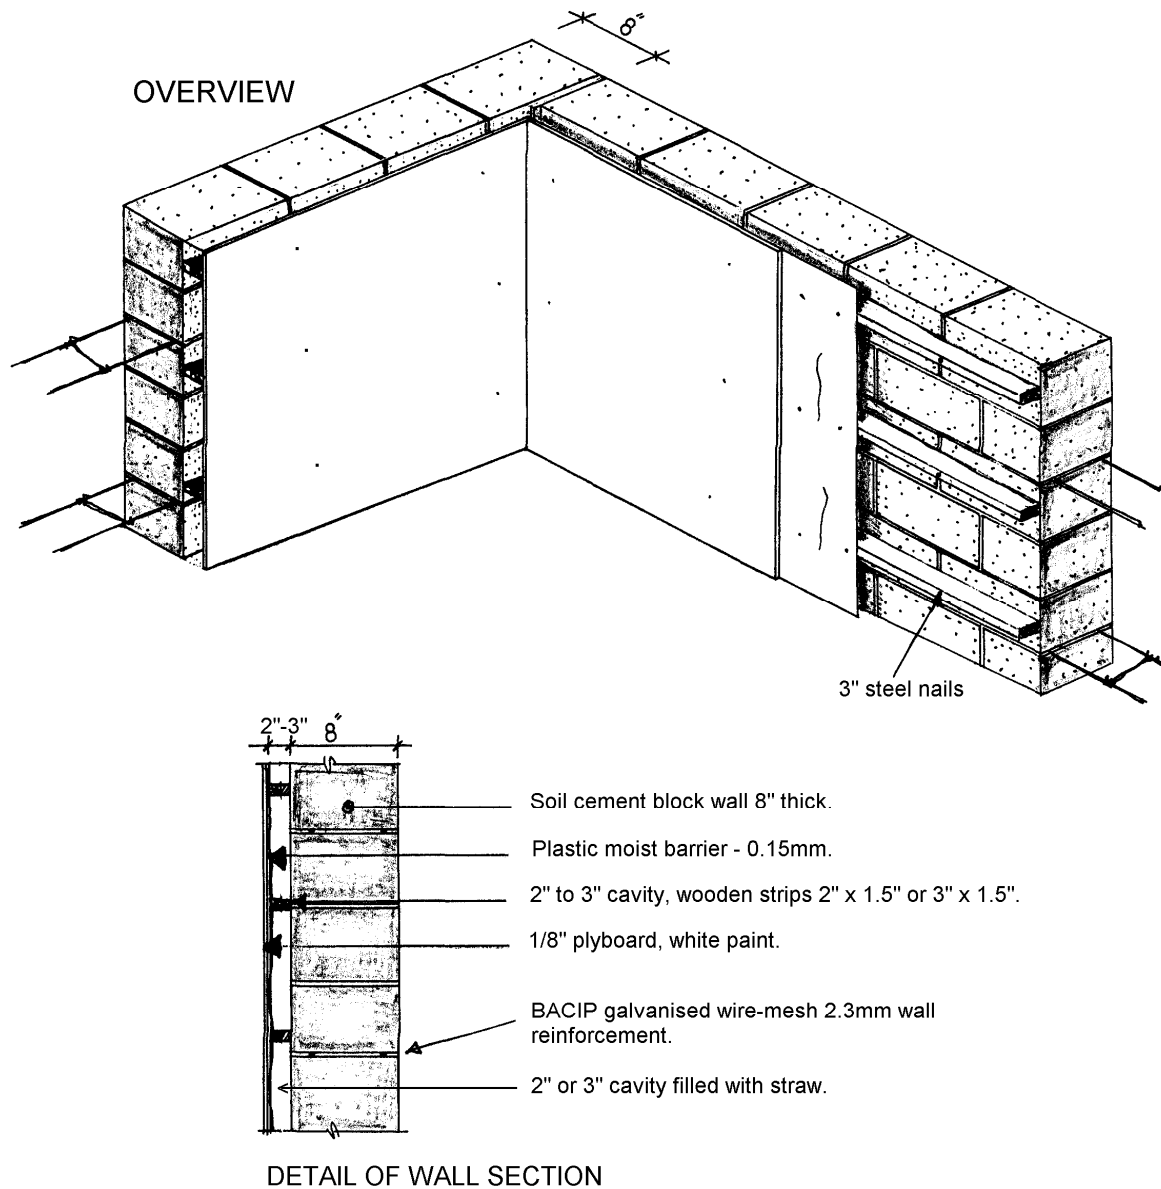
DESIGN CODE 5.6.4.N – WOODEN STRIPS ON CEMENT BLOCKS, STRAW, PLASTIC, PLYWOOD
